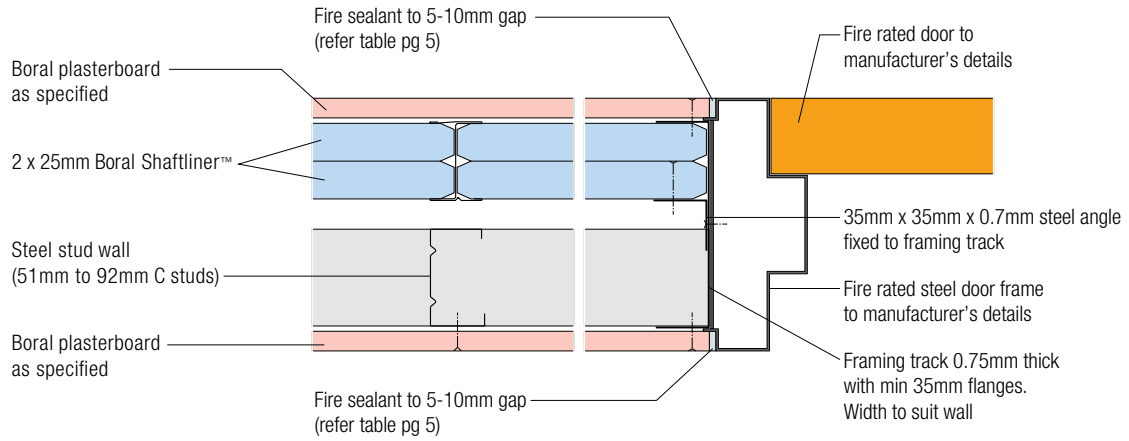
Shaftliner™ Panels to Door Junction Detail 1
